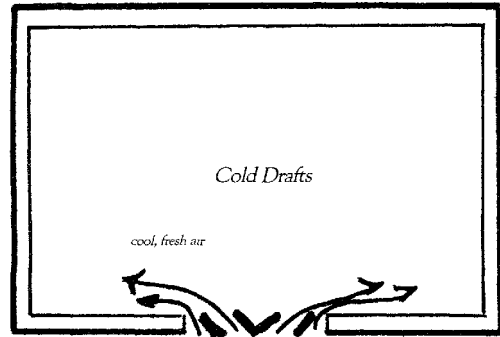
Floor Grill with Vertical Louvers at Side Wall
